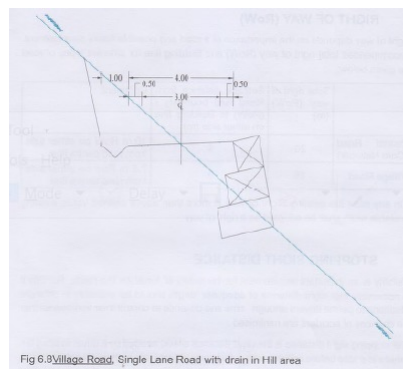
Village Road, Single Lane Road with drain in Hill area
